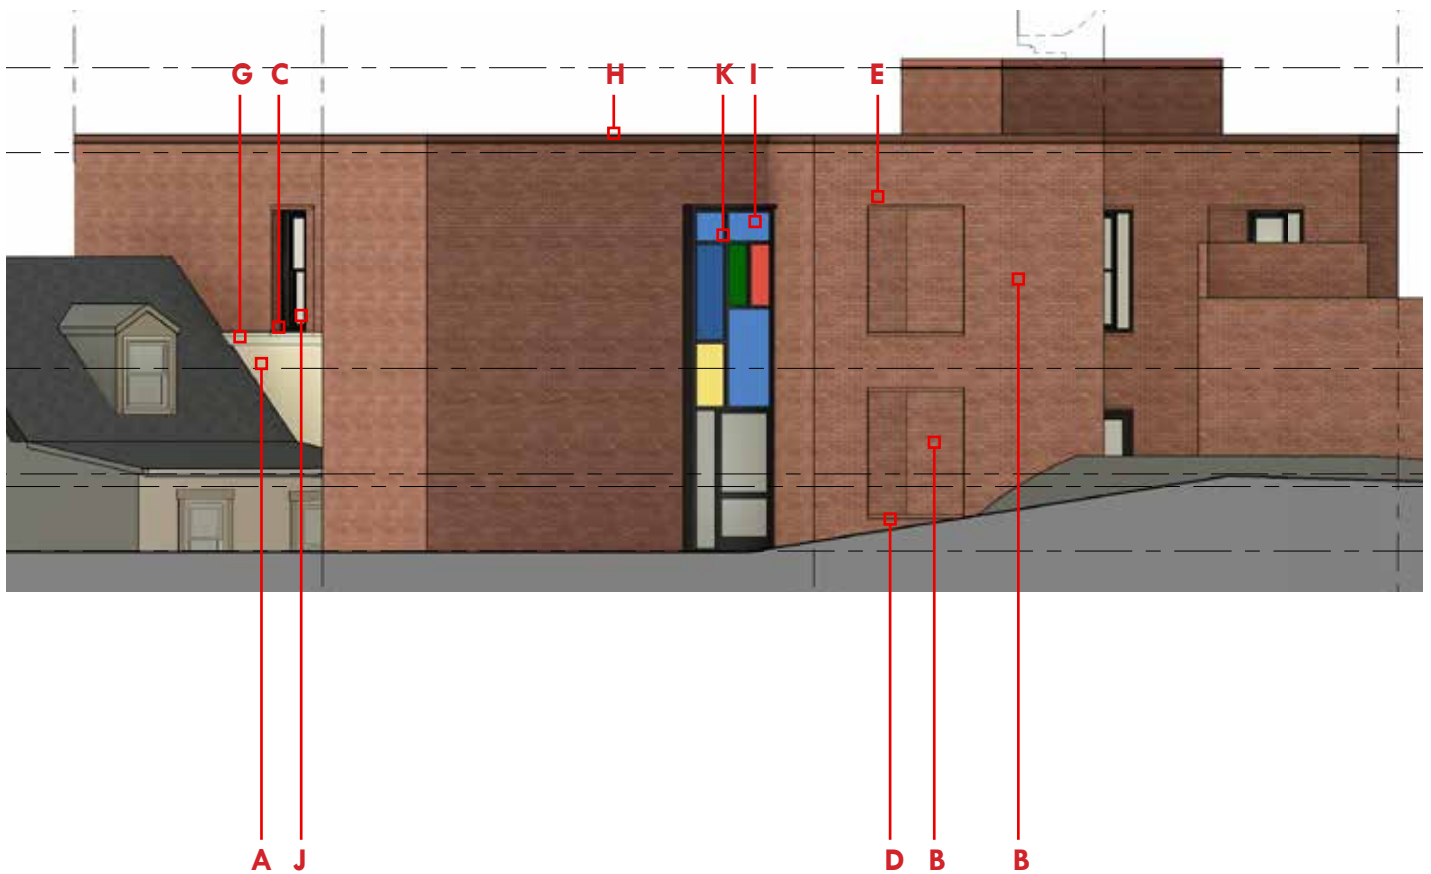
Proposed 335-339 West Fourth Street, North Elevation; Drawn by Spillman Farmer Architects
